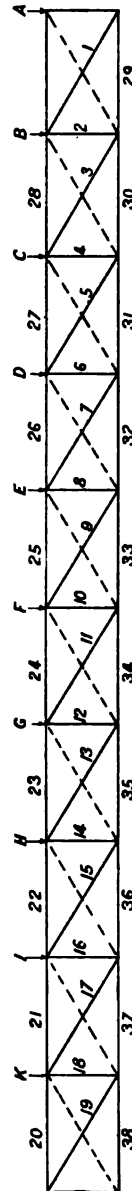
Plan of Cantilever Showing Wind Bracing.
